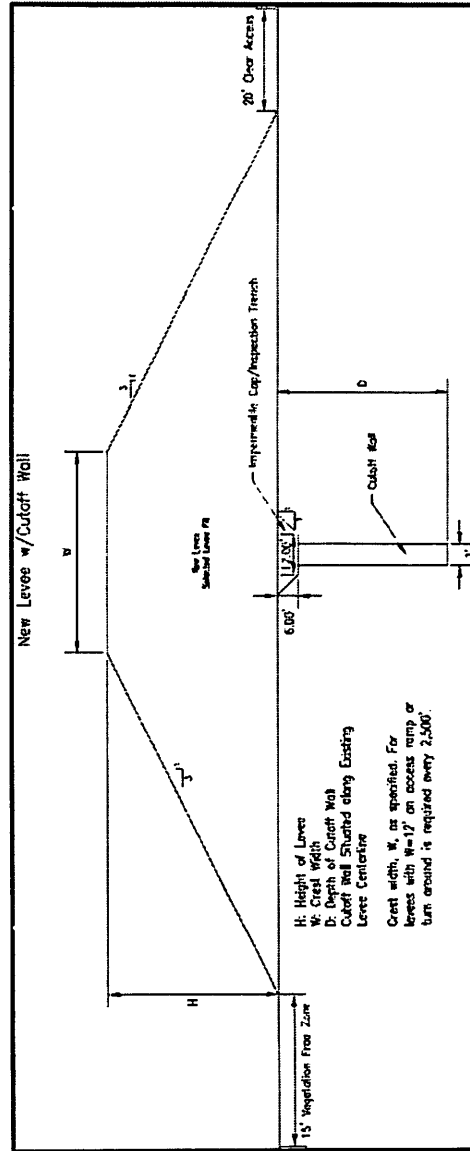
New Levee with Cut-off Wall Typical Plan.
